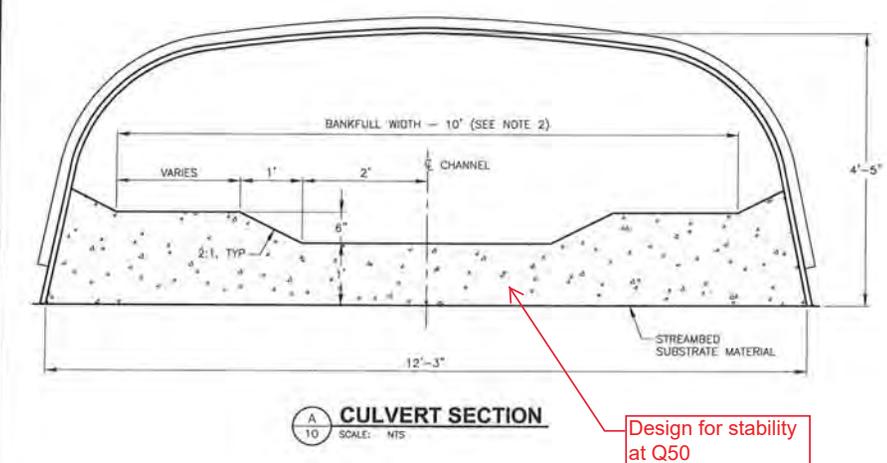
ROCK CLUSTER EXAMPLE - BANKFULL WIDTH CULVERT
